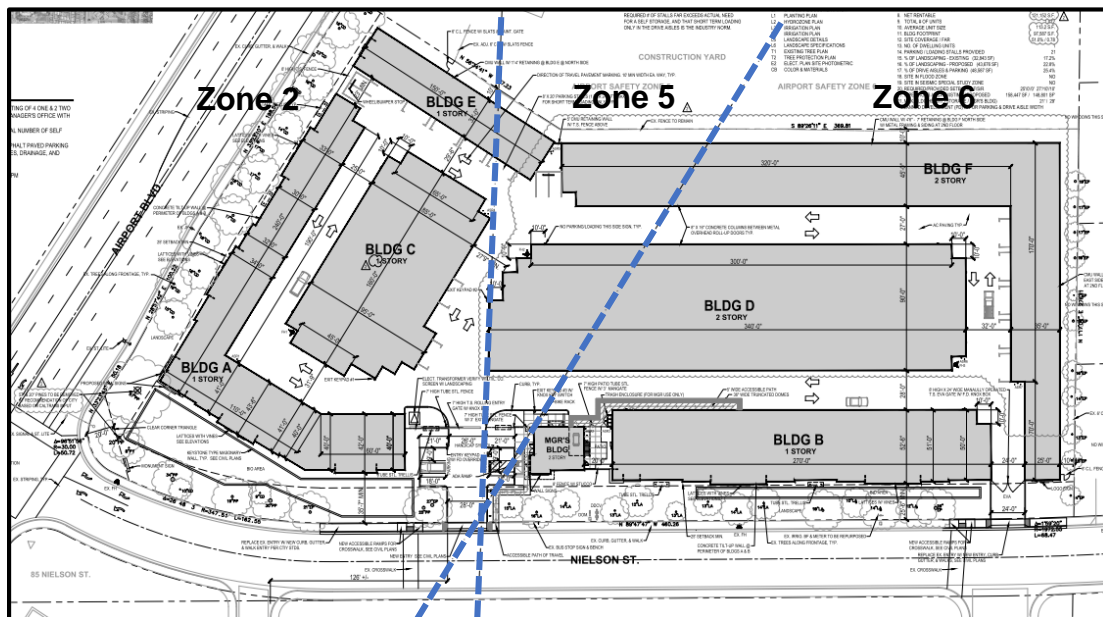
Airport Safety Zones overlain on the proposed Site Plan
